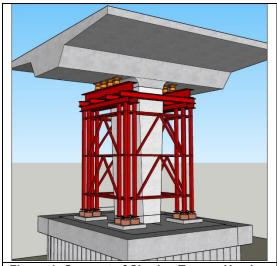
Concept of Shoring Towers Used as Temporary Bridge Support
